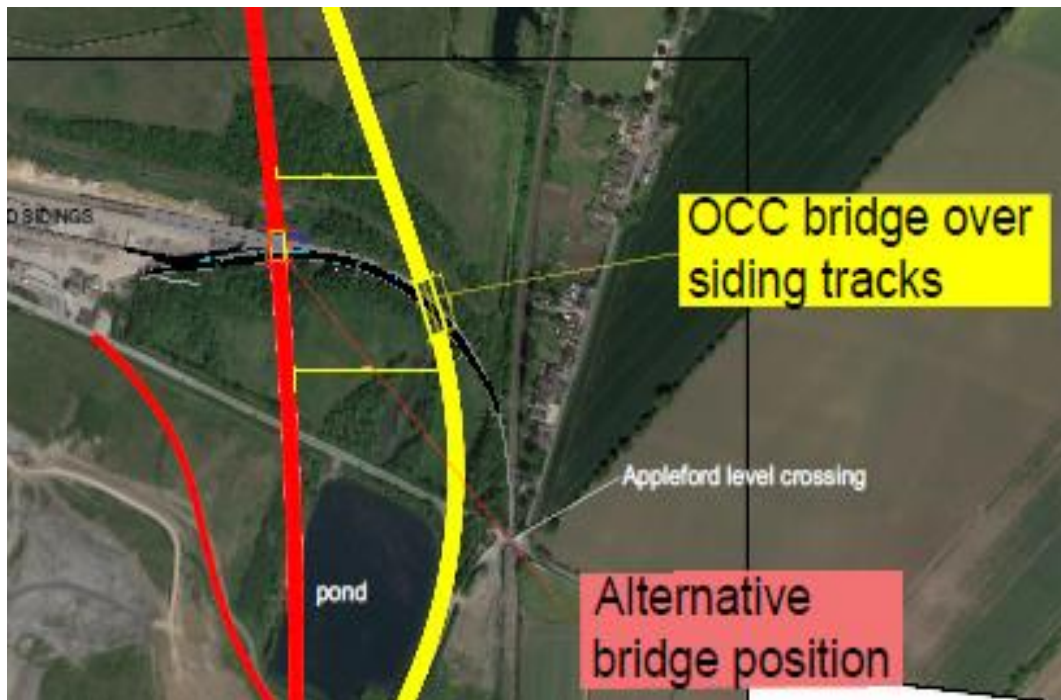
plan illustration of alternative position (in red) for HIF1 road and bridge crossing Appleford rail sidings.
